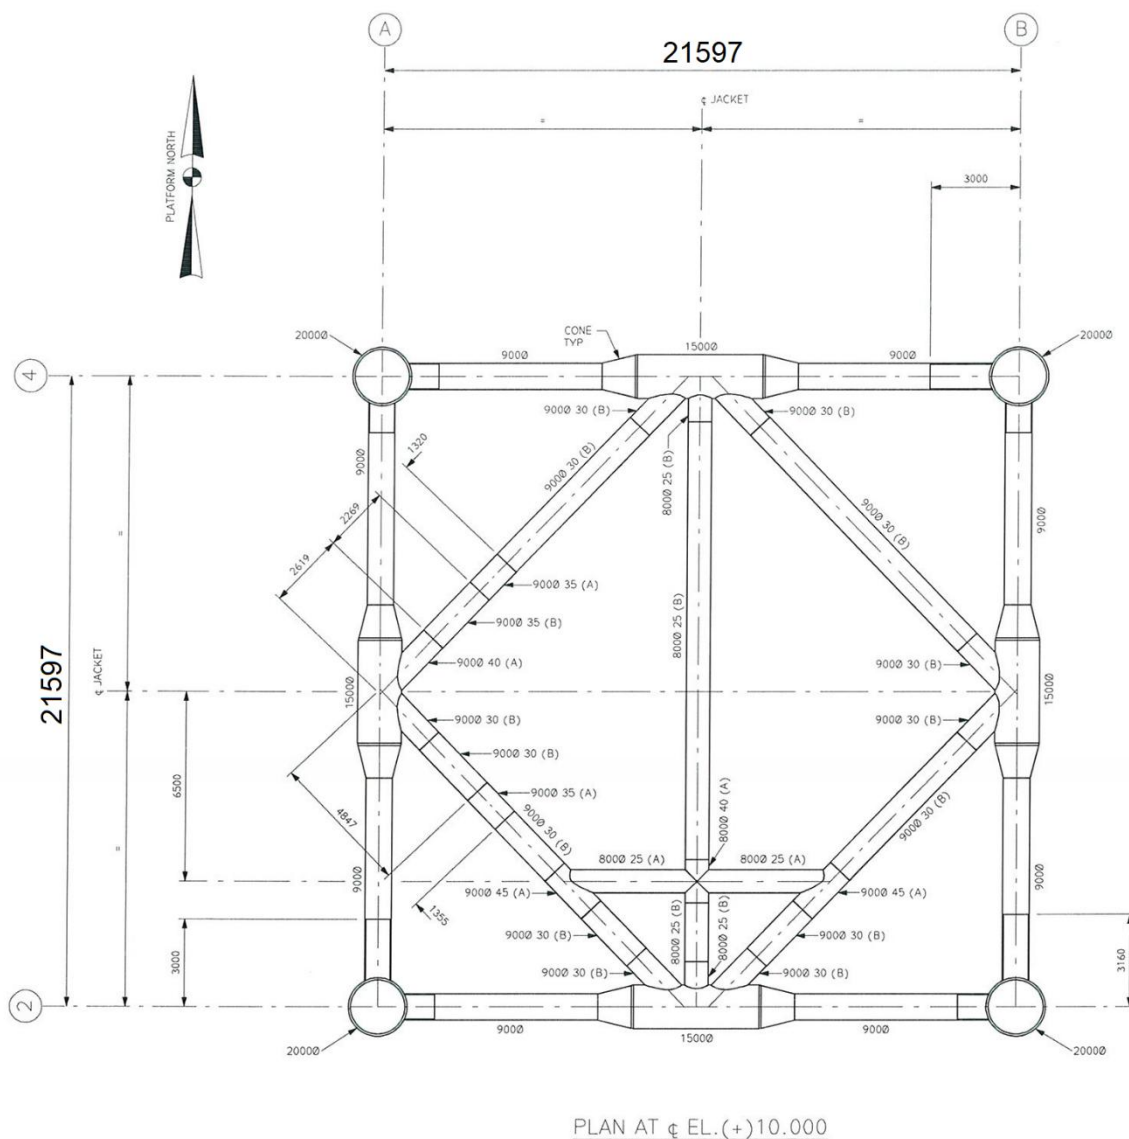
Solan jacket bracing plan at EL. +10.000
